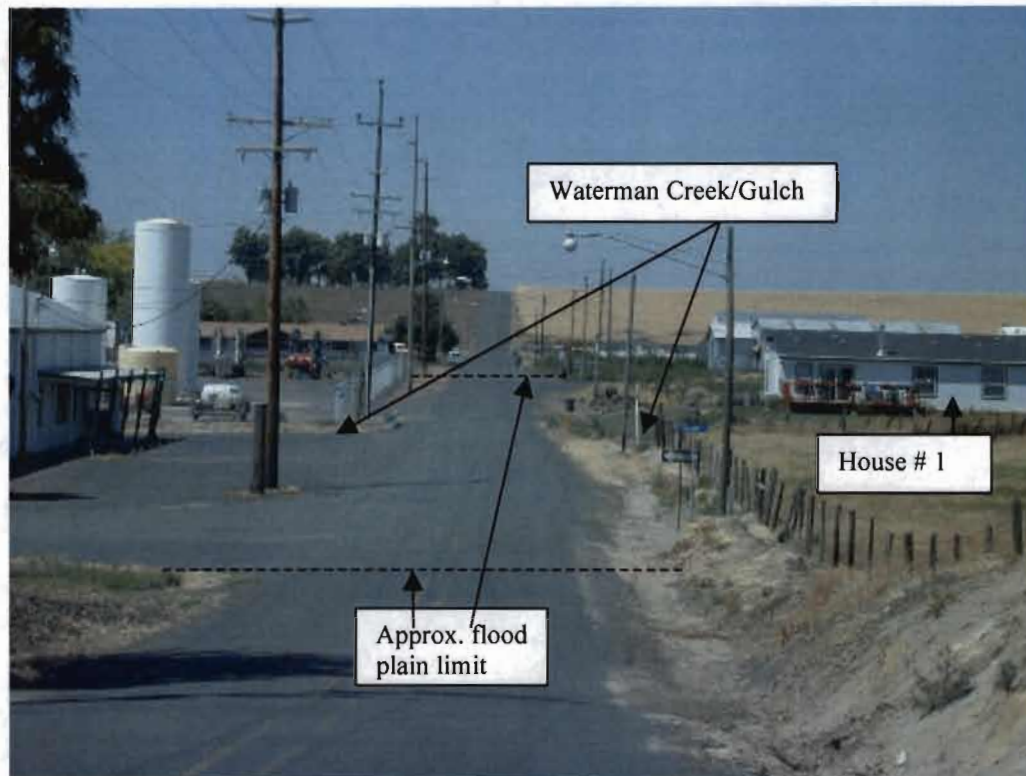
View looks west at crossing and flood plain of Waterman Creek/Gulch.
